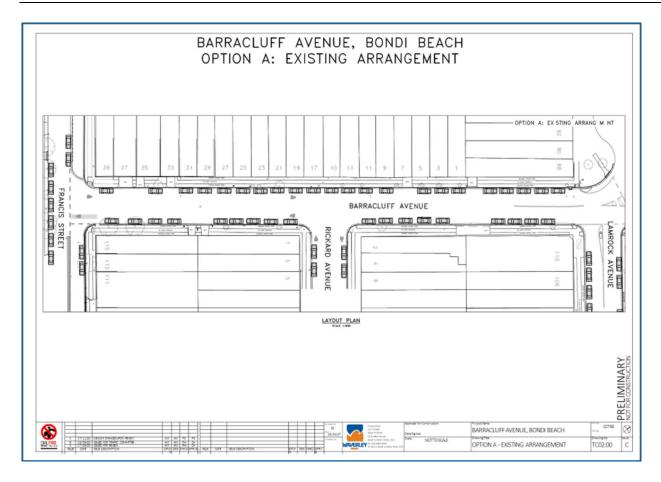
Option A – Existing traffic arrangement in Barracluff Avenue.
